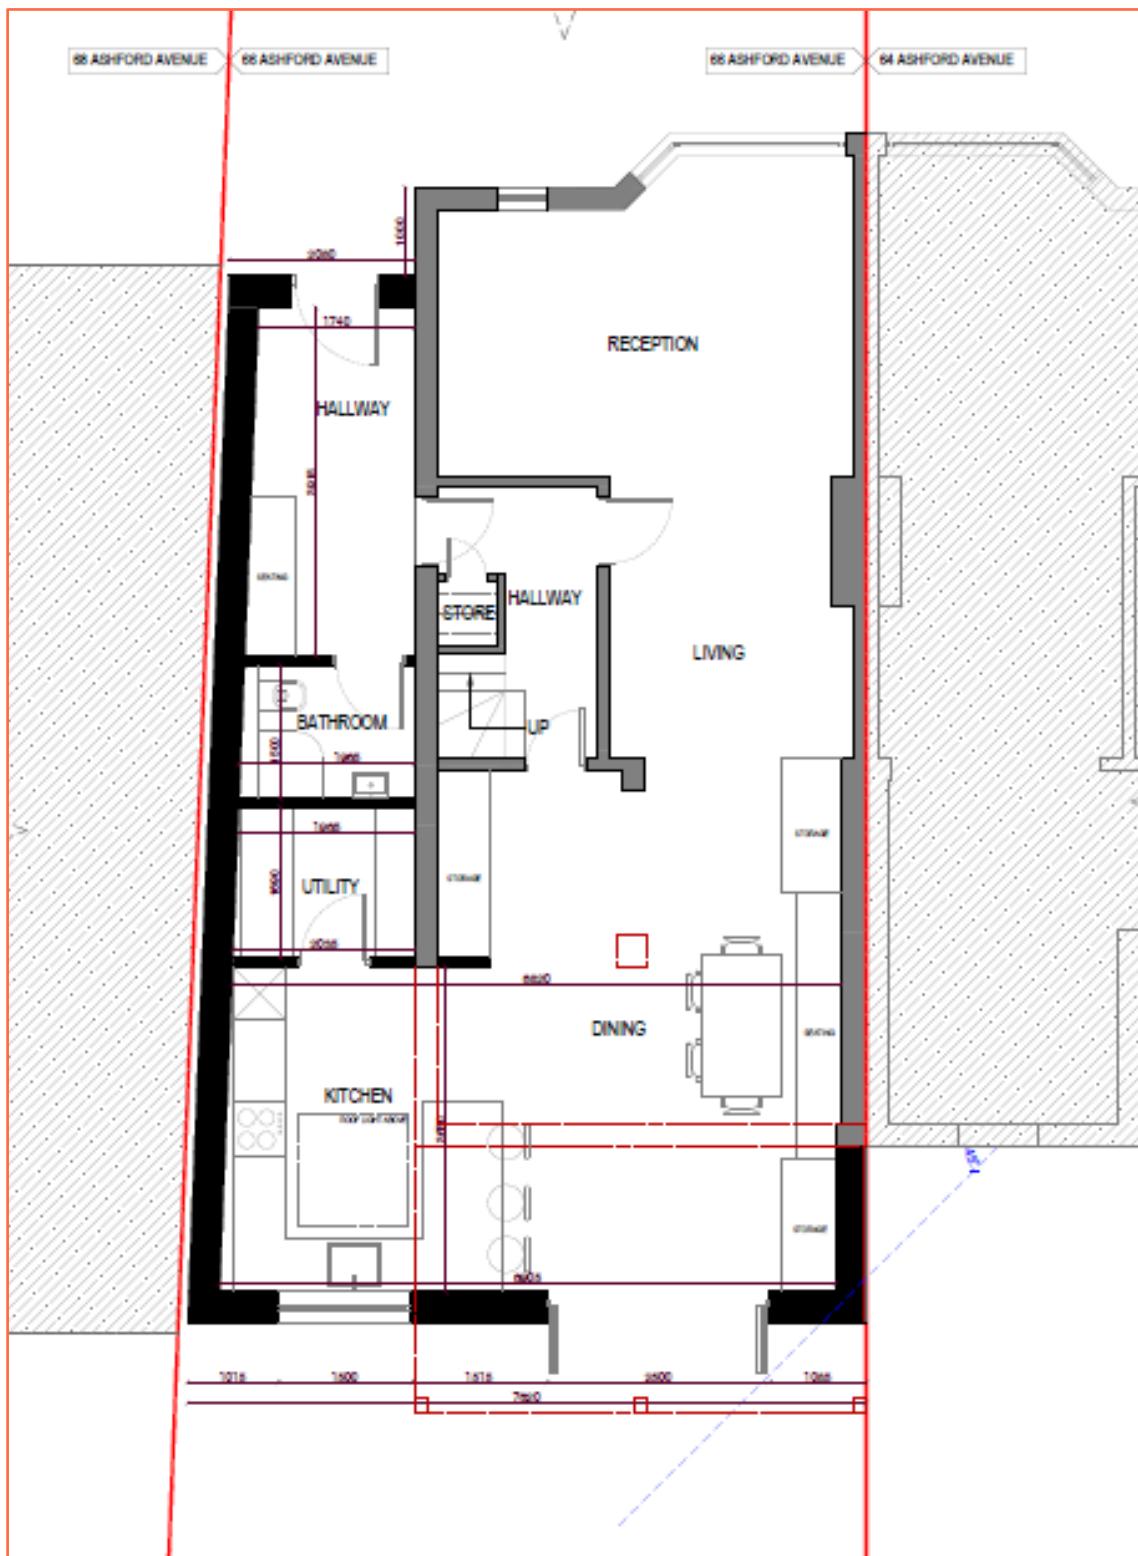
Proposed ground floor for wrap around extension (Source: AMBA Architecture)
